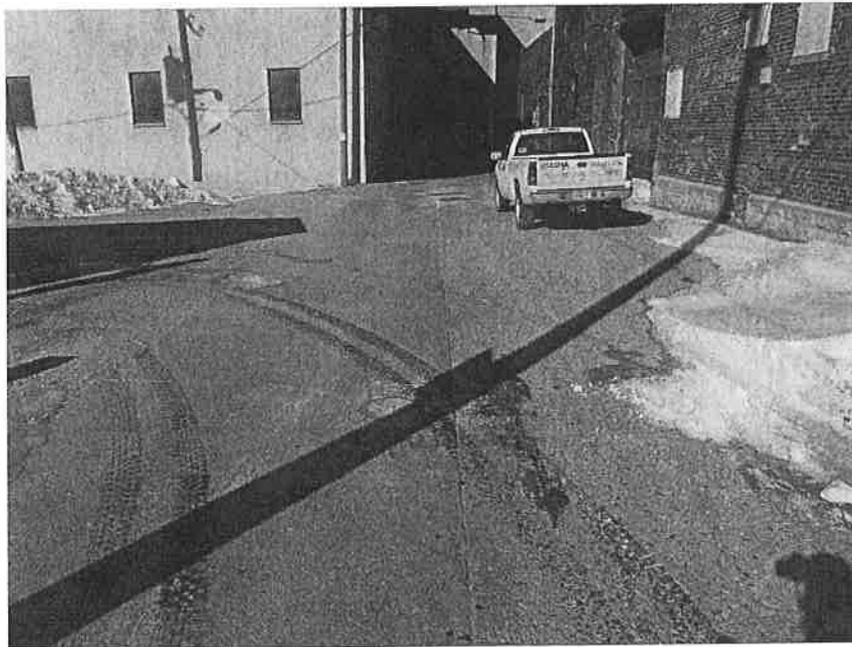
Typical pavement View to north; photograph taken on February 19, 2015.
